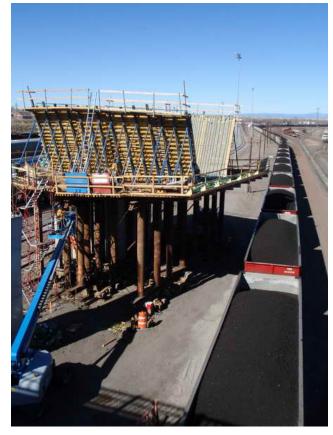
Pier Table 4 WB Construction – February 11, 2009:
